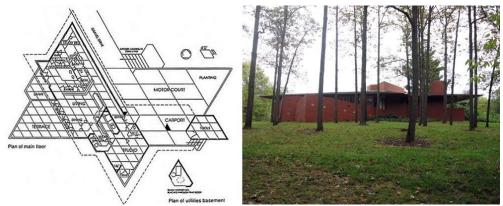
Frank Llyod Wright, Krause House in Kirkwood, Missouri, 1952 Plan (URL 26) and Elevation (URL 27)
